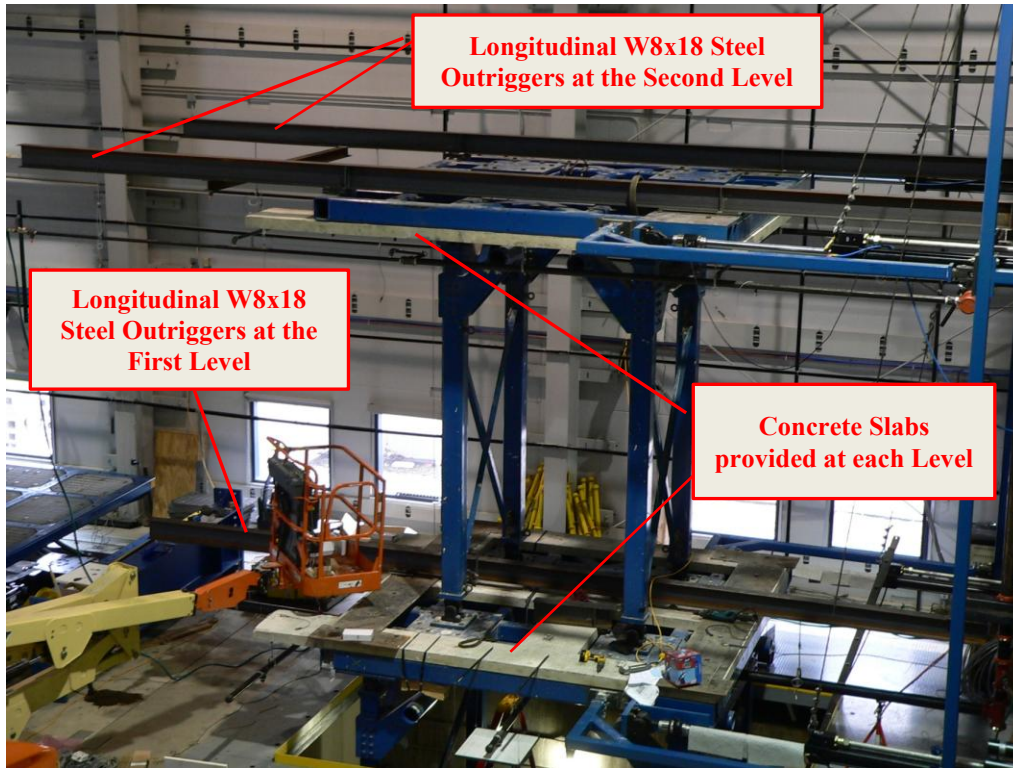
General view of outriggers welded on the UB-NCS machine
